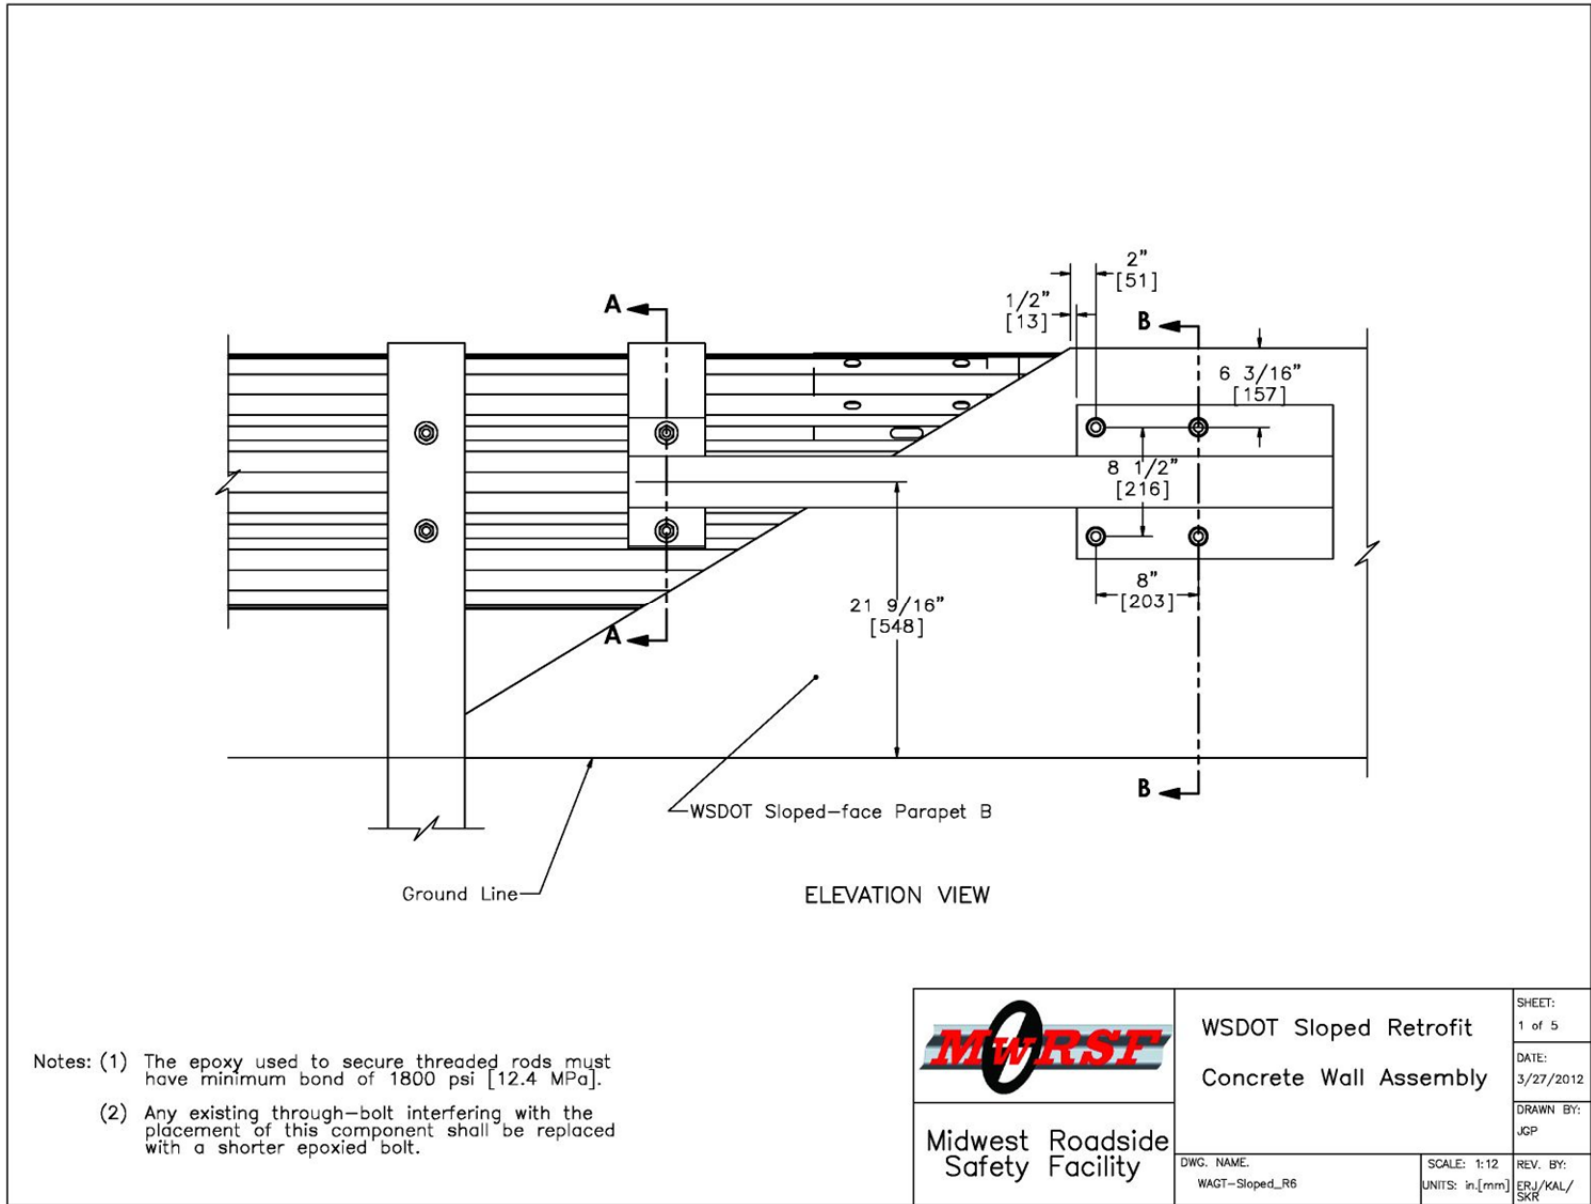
Retrofit 1 – Sloped-End Concrete Wall Assembly – Back View
